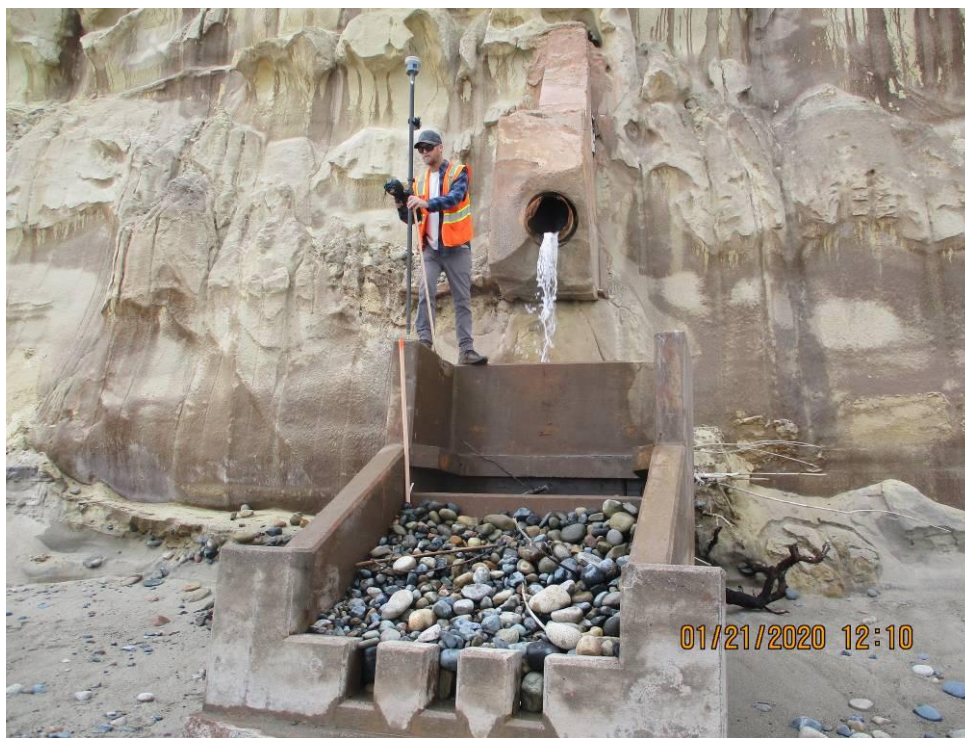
Benchmark BM12, created on 21 January 2020, is located on top of the concrete drainage structure located just north of transect S1000.
